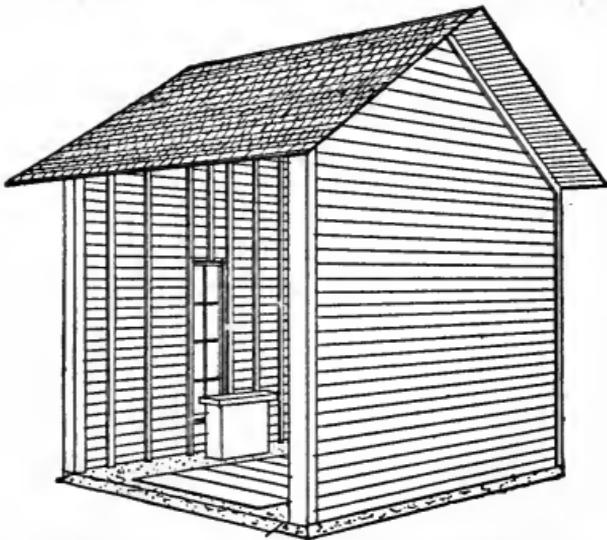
Farm Scale House with Concrete Foundation and Scale Pit
